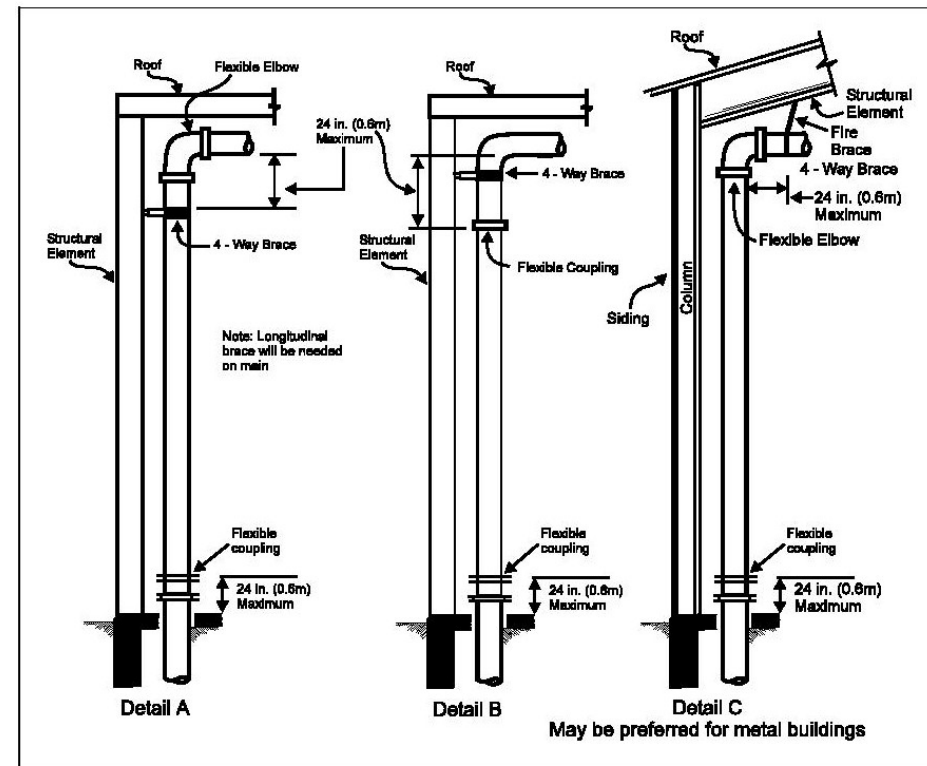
Flexible coupling and four-way sway bracing details for riser. NOTE: for risers located outside of buildings, Detail A or B may be used with the bracing attached to a structural element.
